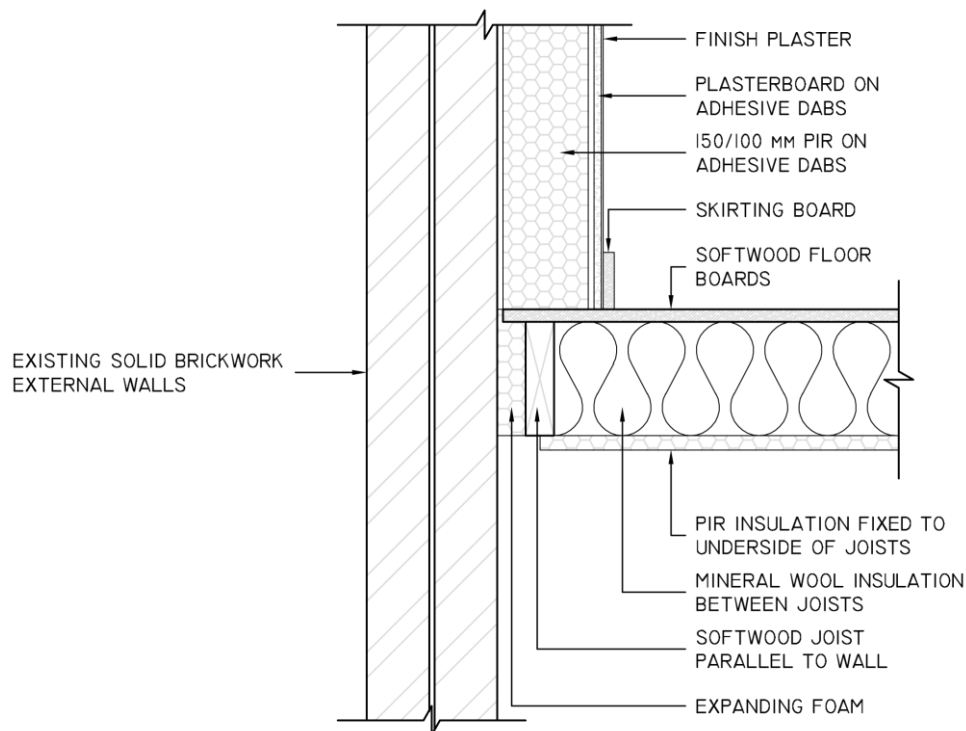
Ground Floor Junction with Joist Parallel to External Wall
